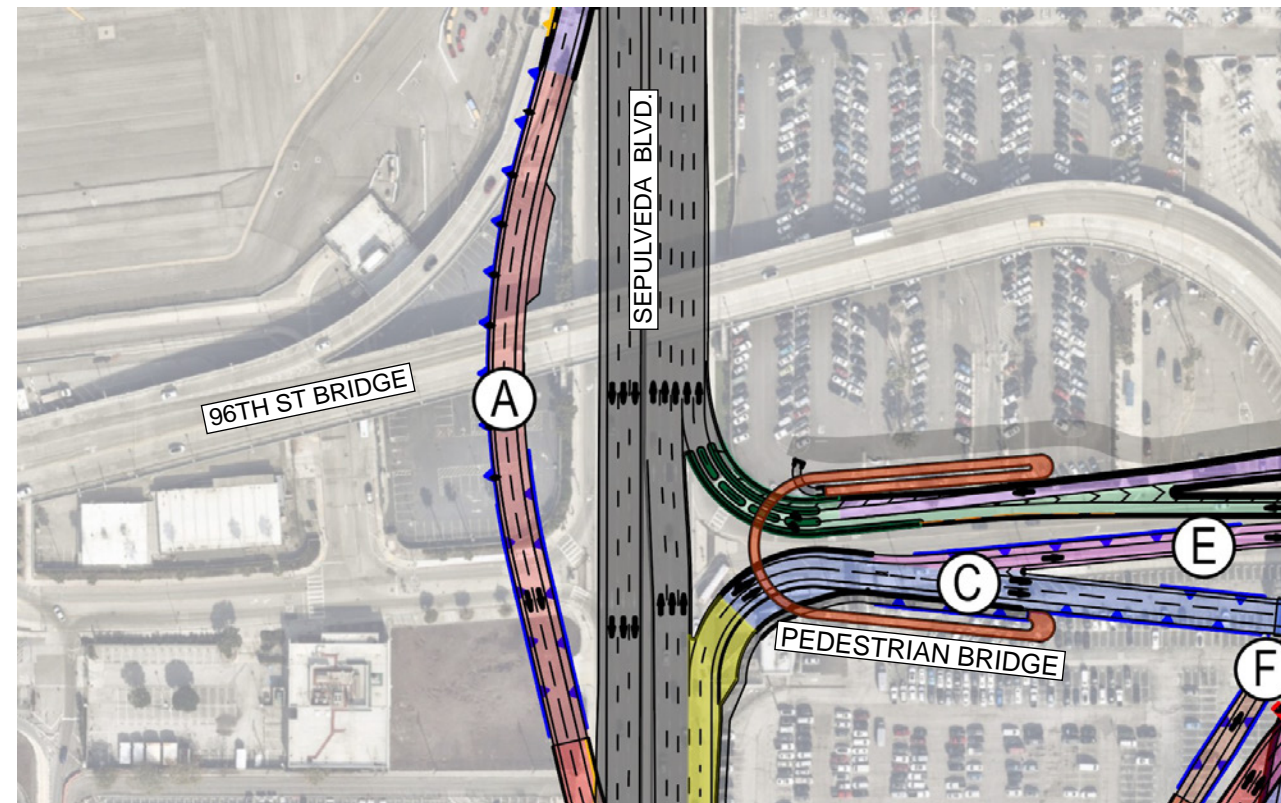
The offramp from Sepulveda Boulevard southbound, designated as Segment A, would be realigned so that it would not conflict with existing support columns under the 96th Street Bridge.
